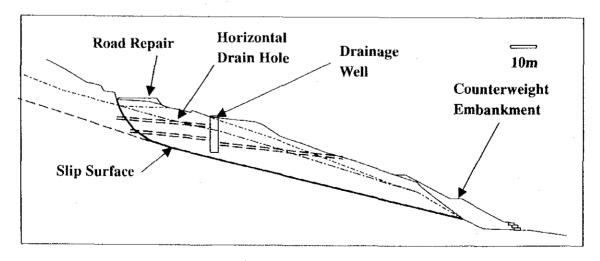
Cross Section (Horizontal Drainage and Counterweight Embankment)
